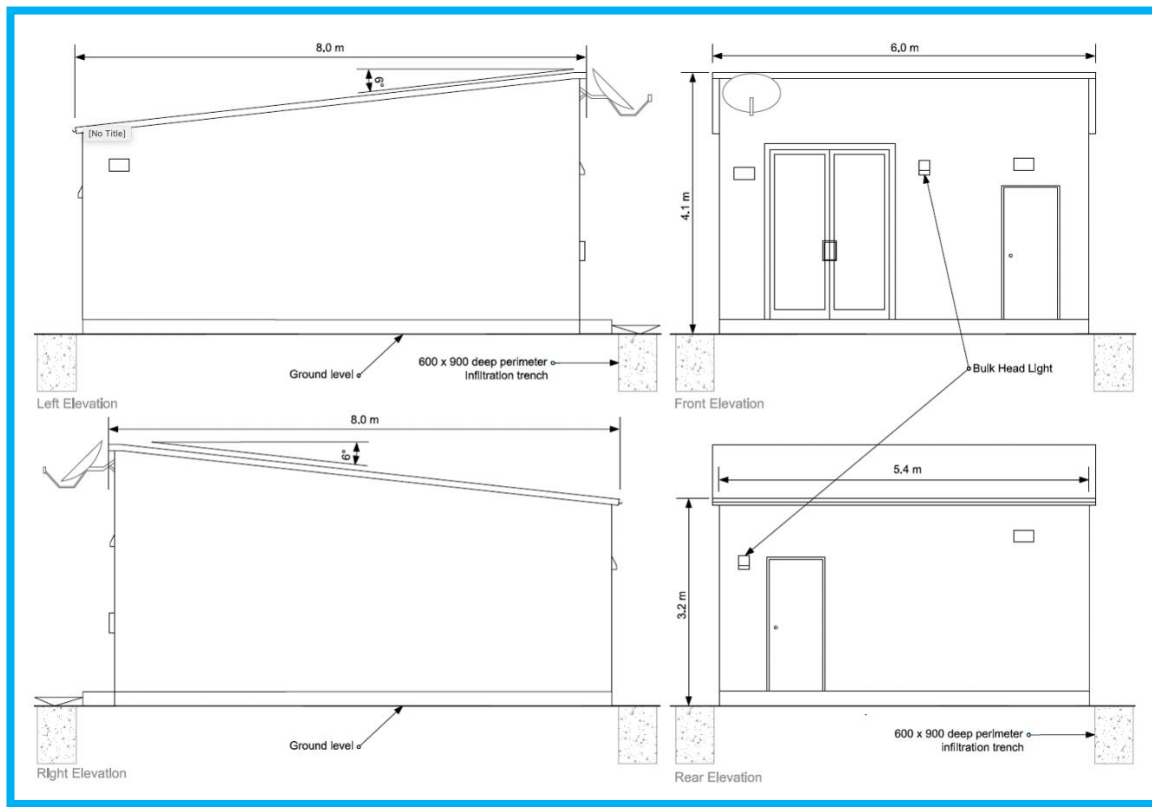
DNO substation 6m x 8m in plan with 600mm x 900mm deep perimeter infiltration trench.
